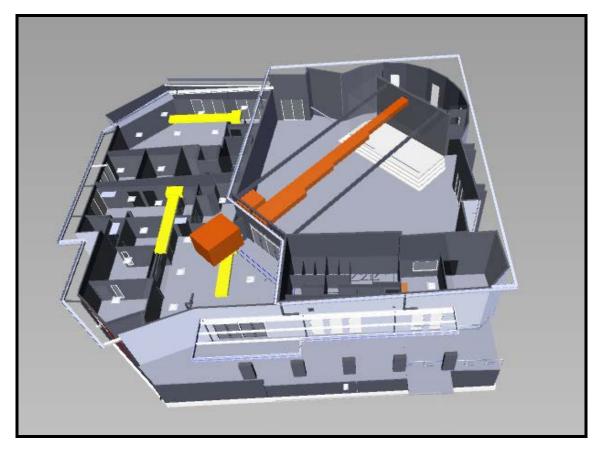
Level 2 Office Layout using Autdesk Navisworks Hide Element
